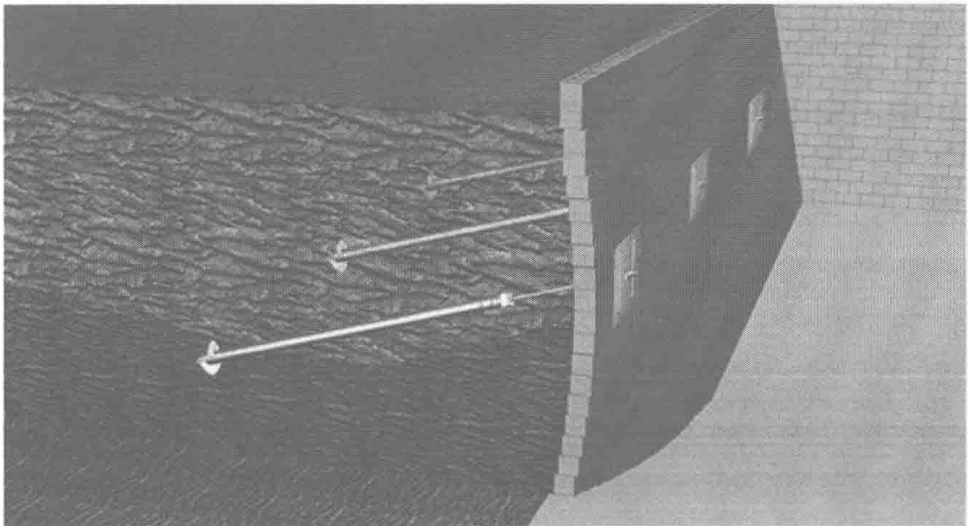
Multiple helical anchors supporting a retaining wall.
